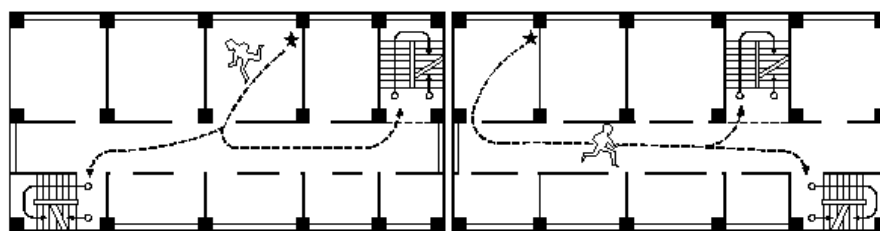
Well-balanced Layout of Escape Stairways (left) and Unbalanced Layout of Escape Stairways (right)(JICA, 2003).
